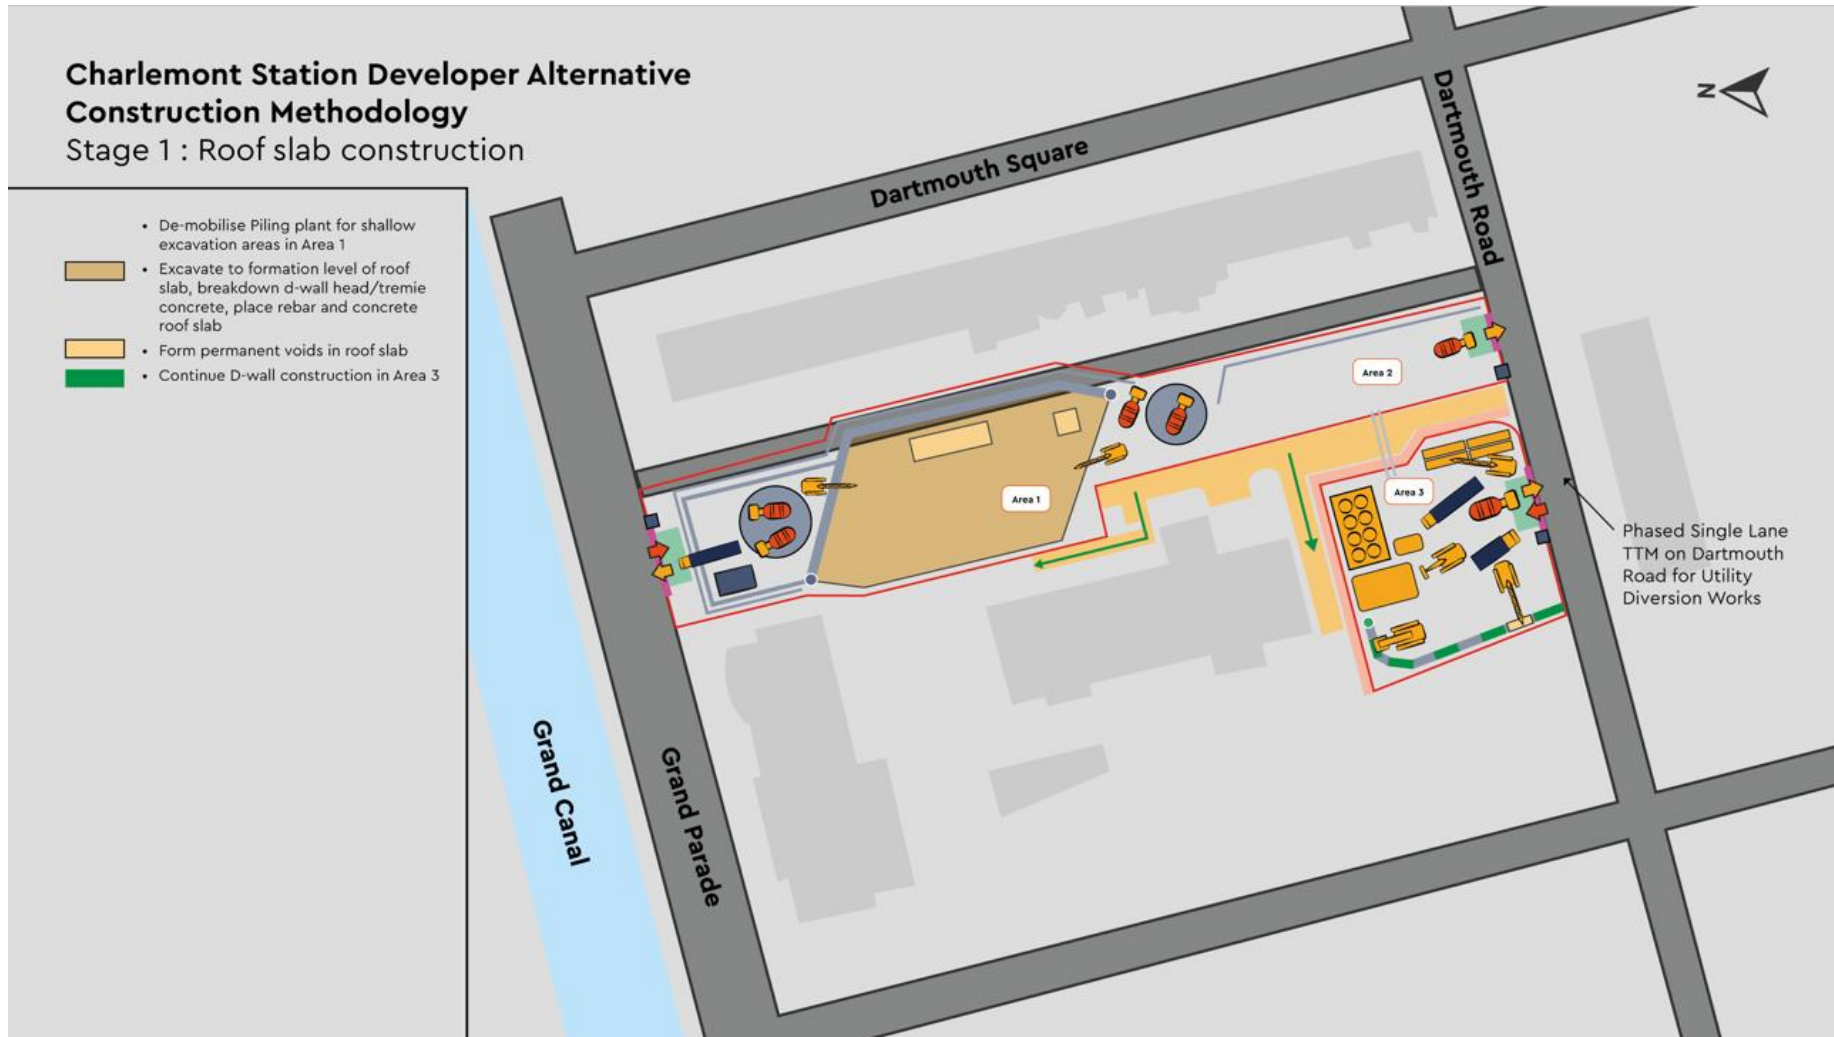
Charlemont Station Stage 1 – Roof slab construction
